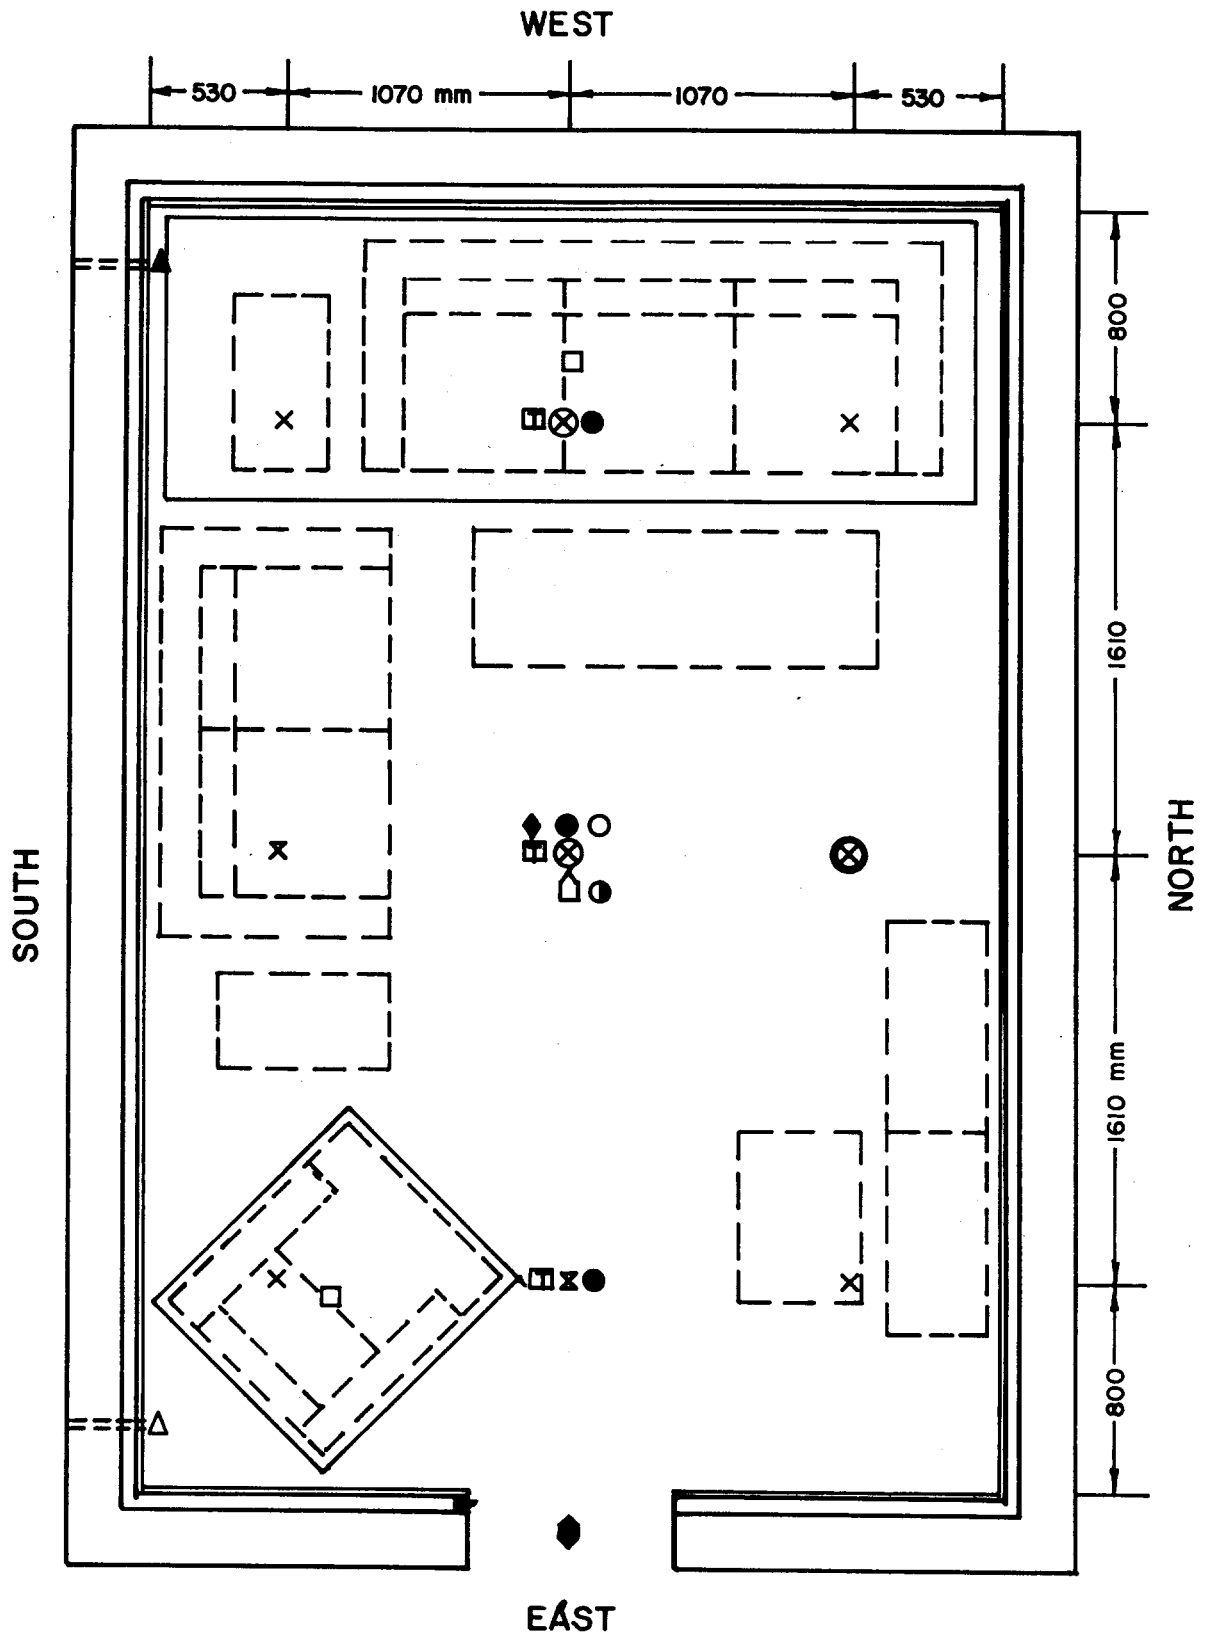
Plan view of the 3.3 x 4.9 m test room showing instrumentation layout
